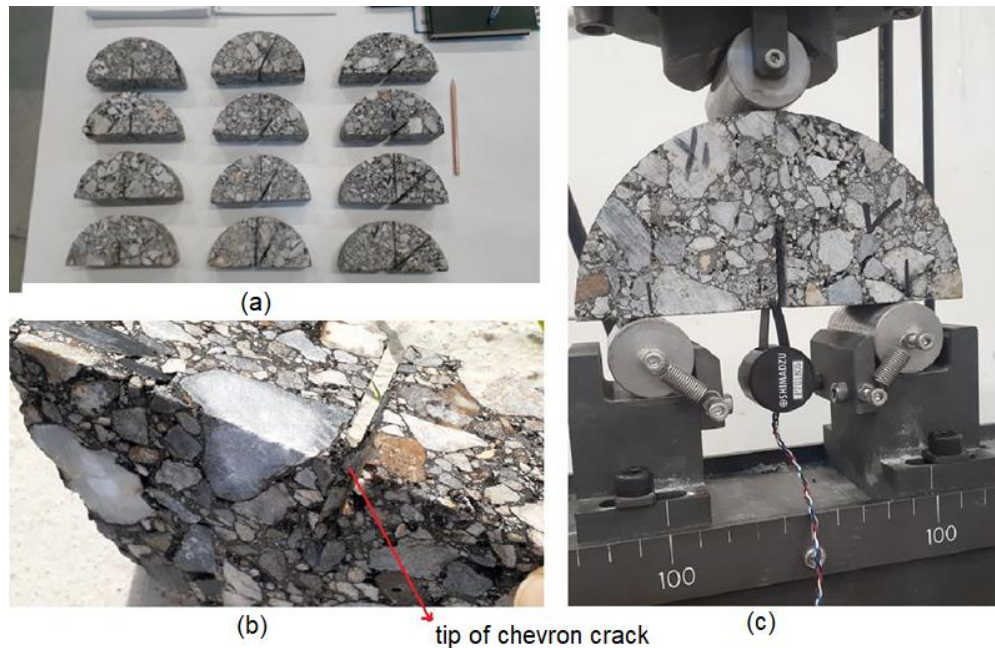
(A) Some prepared SCB specimens, (B) tip of chevron crack and (c) COD gauge attached to a specimen
